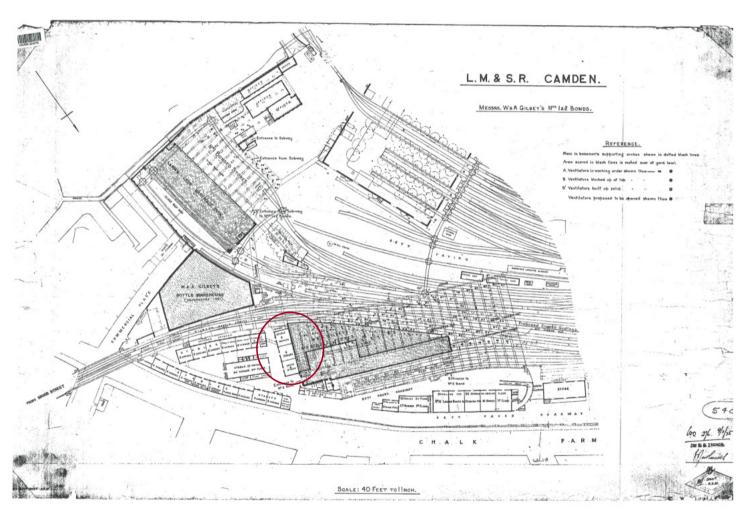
Stables Market – Site plan dated 26<sup>th</sup> November 1882.
